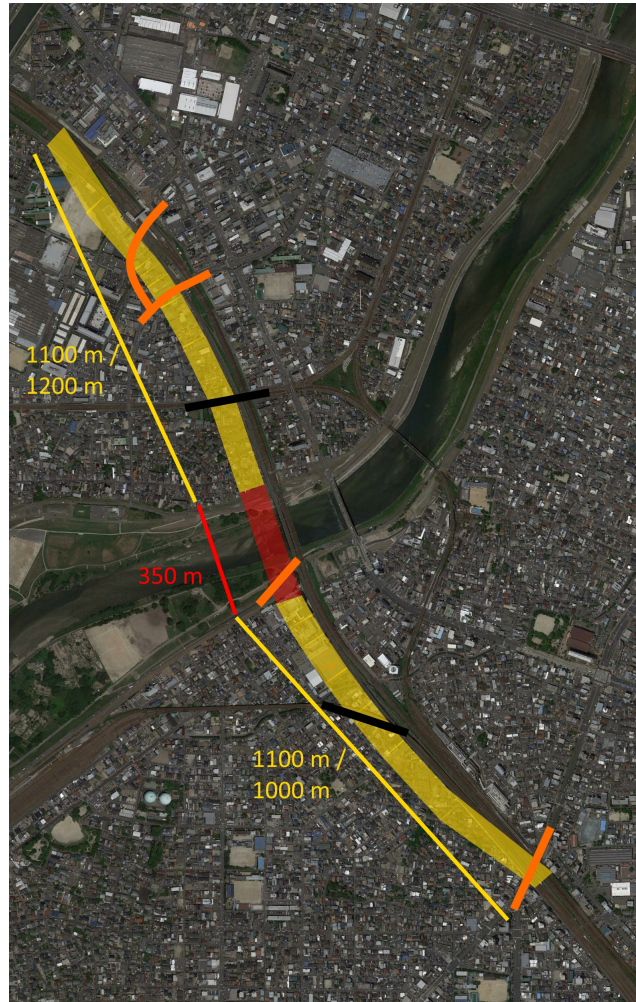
Area map of a new tunnel for the railway. Yellow: Tunnel entrance, Red: Tunnel, Black: Crossing railway, Orange: Main road
